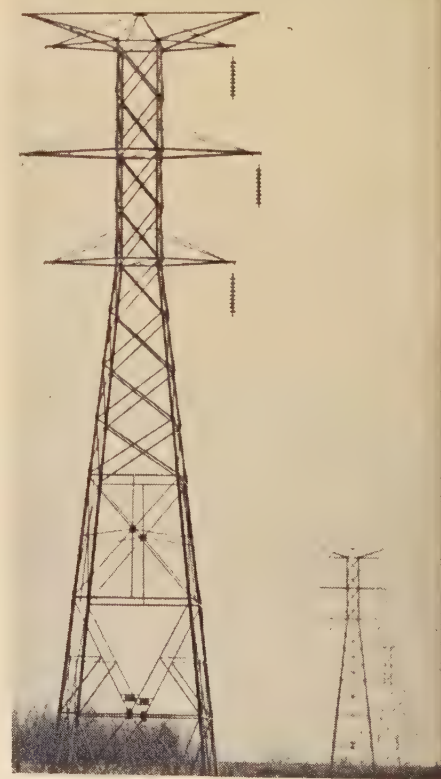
Tower construction and conductor arrangement of Lenore-New Castle 132-kv line
